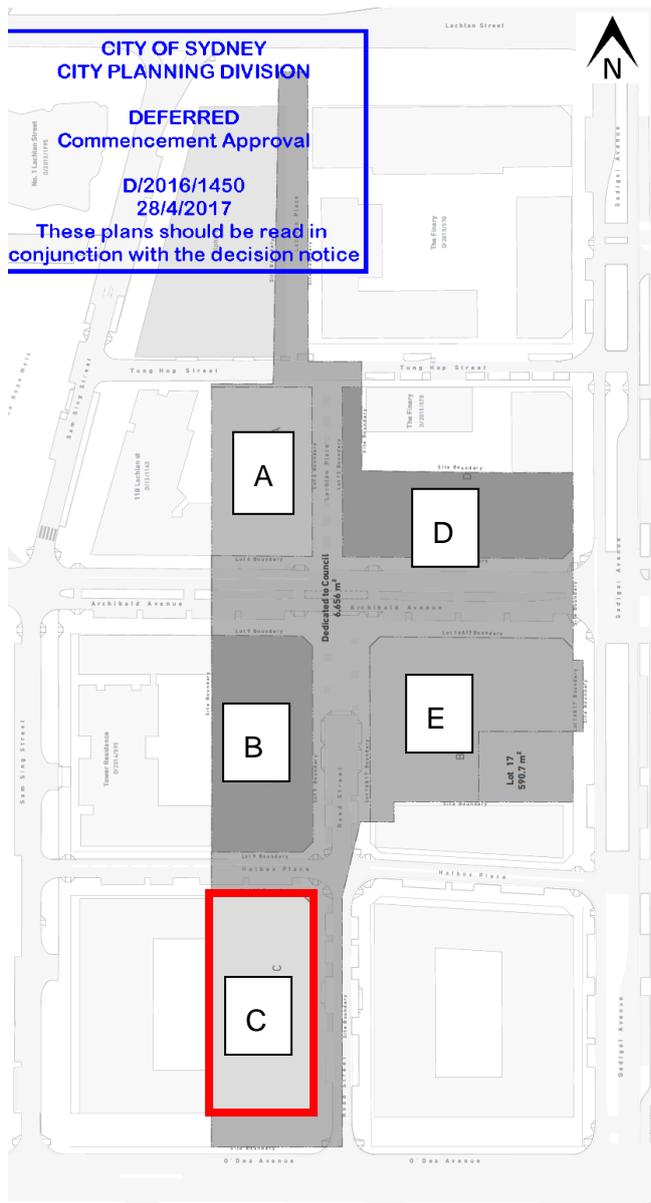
Concept DA approved plans showing proposed new lots and roads. The subject application regards building C, outlined in red
